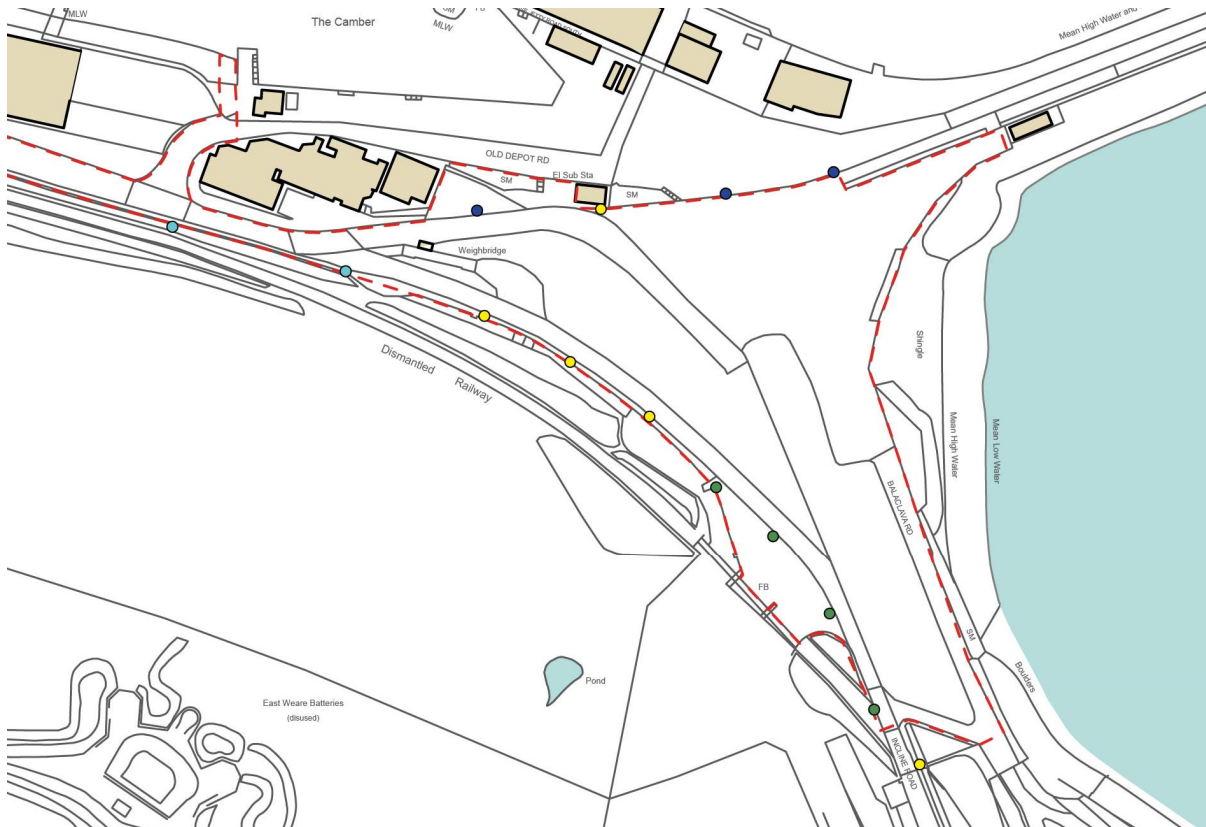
Plan of existing lighting provision including Red Line application boundary
